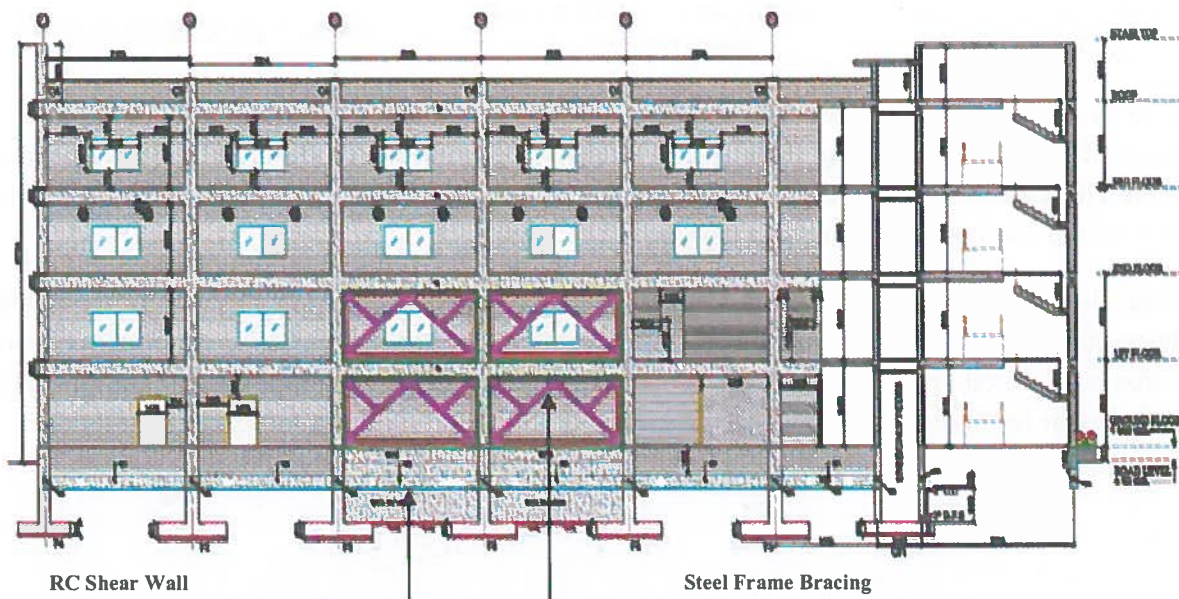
Example of Frame Elevation (After Retrofit)
